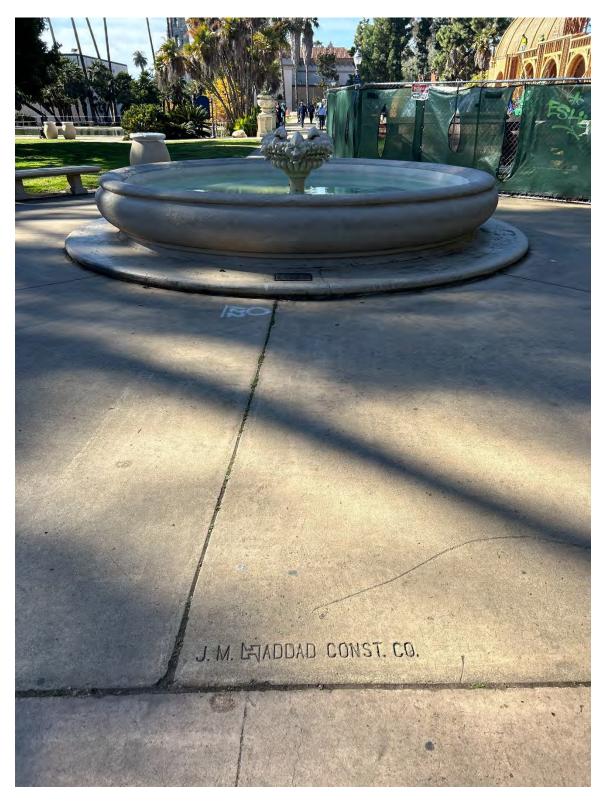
East fountain with J.M. Haddad Construction Company stamped in concrete, facing west.
